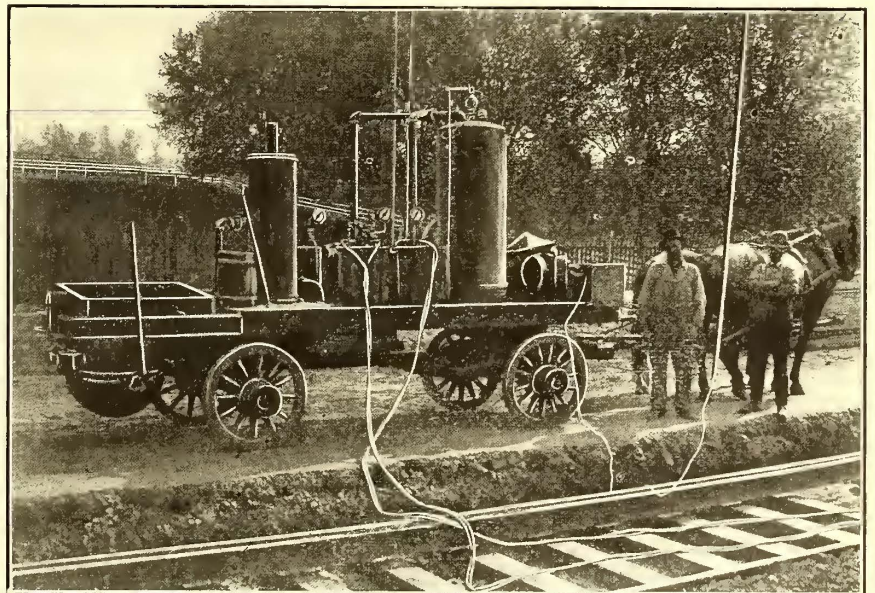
ZINC CASTING TRUCK COMPLETE, WITH BURNERS, COMPRESSORS AND CRUCIBLE
